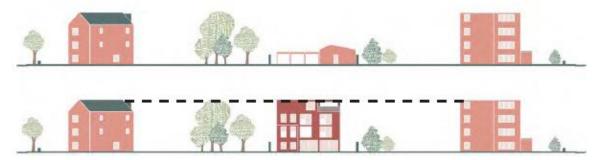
Proposal in back land - height no greater than predominant height of surrounding buildings
